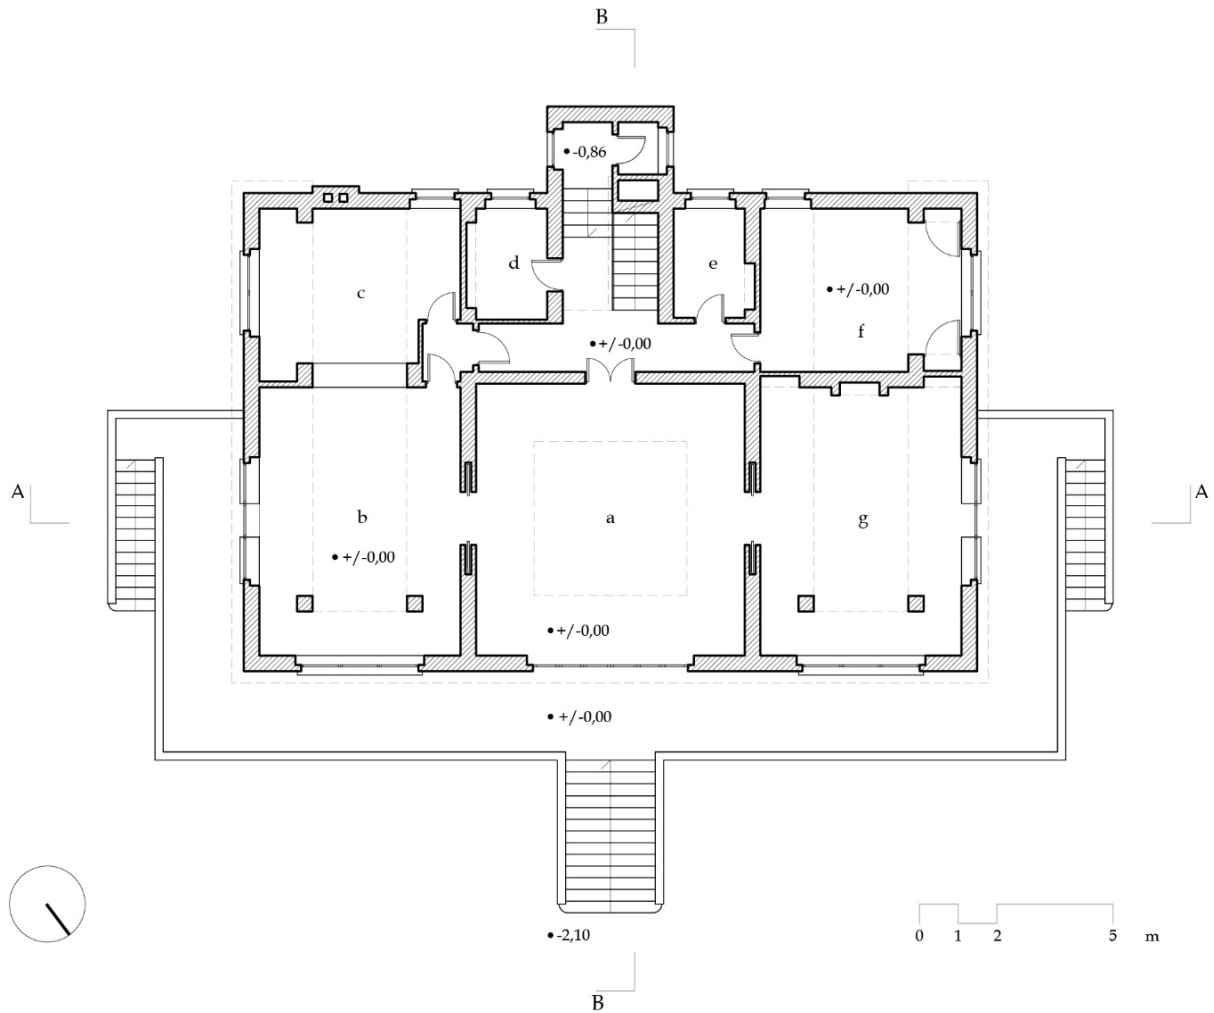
Villa Colli, ground floor (section plan at +1,20 m): a) double-height hall; b) living room; c) kitchen; d) servants bedroom; e) bathroom; f) ménage.
